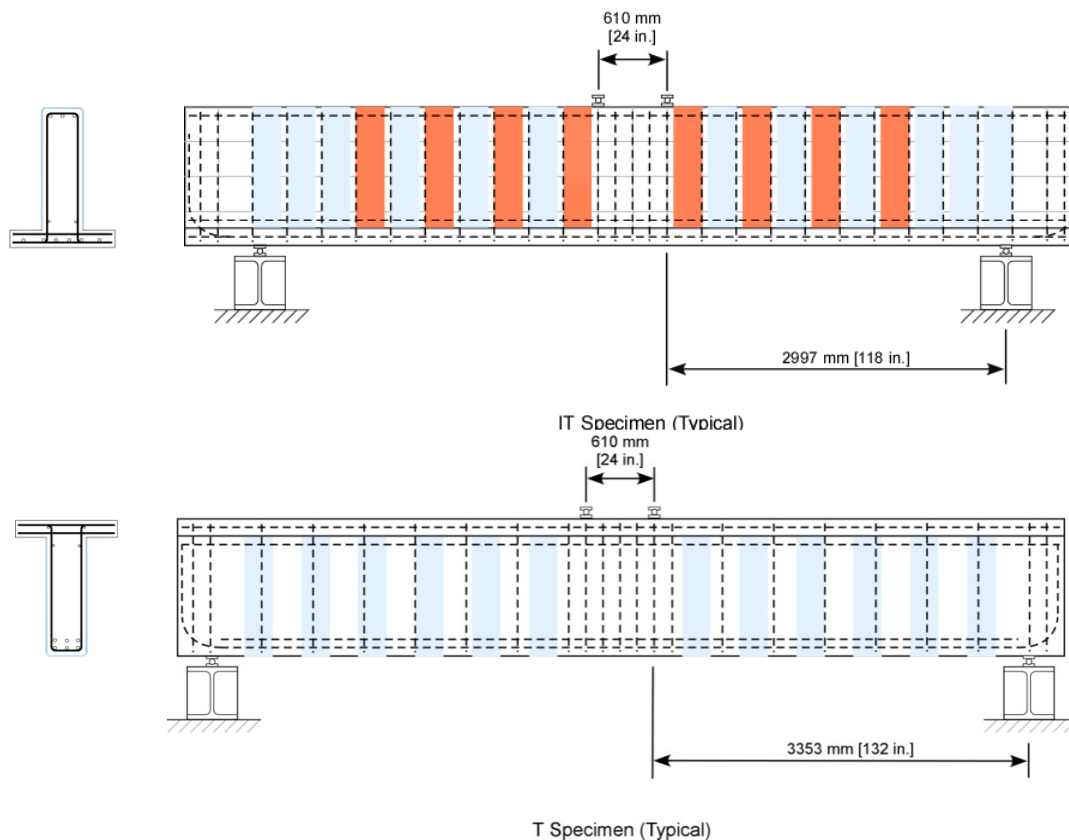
Typical inverted-T and T specimen elevation views.
